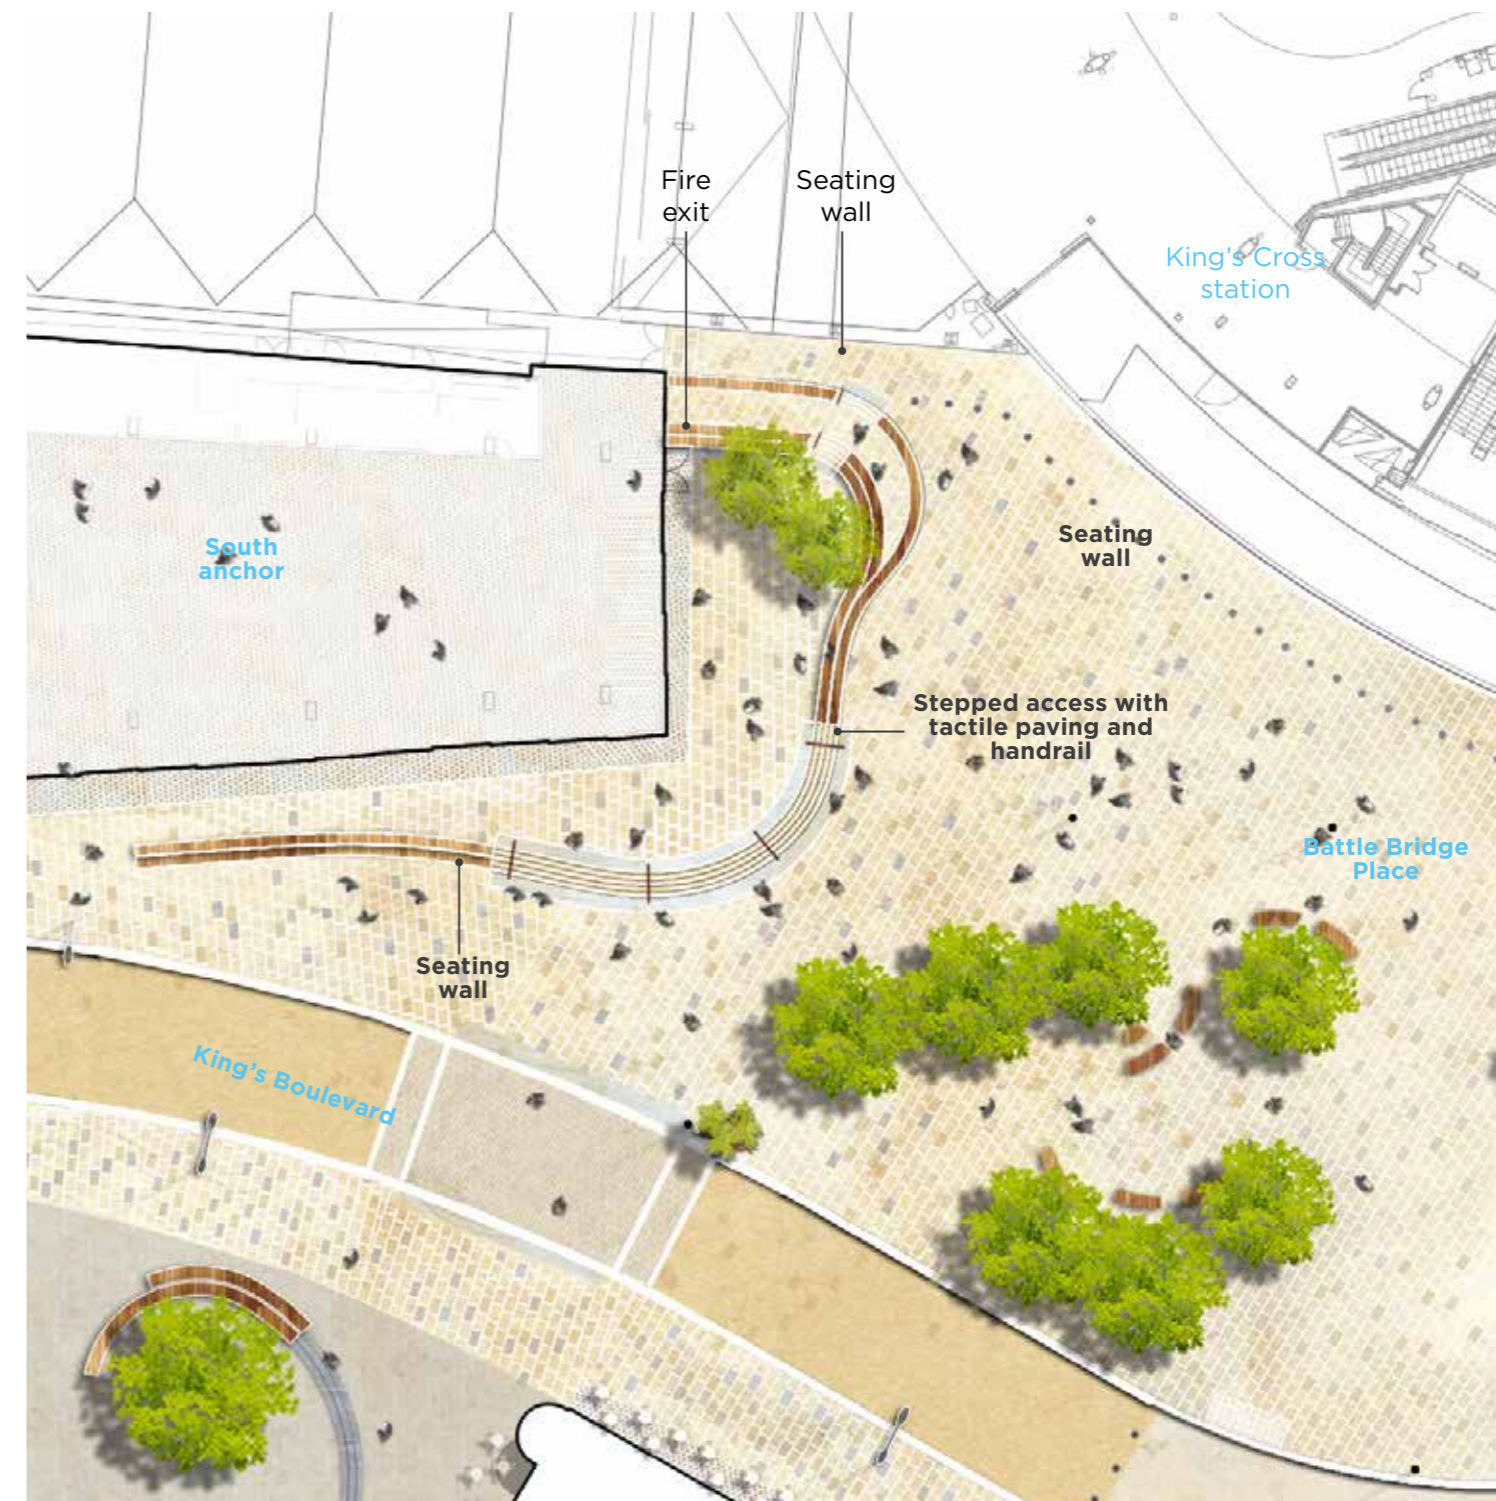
Verified view of Battle Bridge Place looking north towards the Zone A Building and illustrative plan showing public realm proposals at Battle Bridge Place
